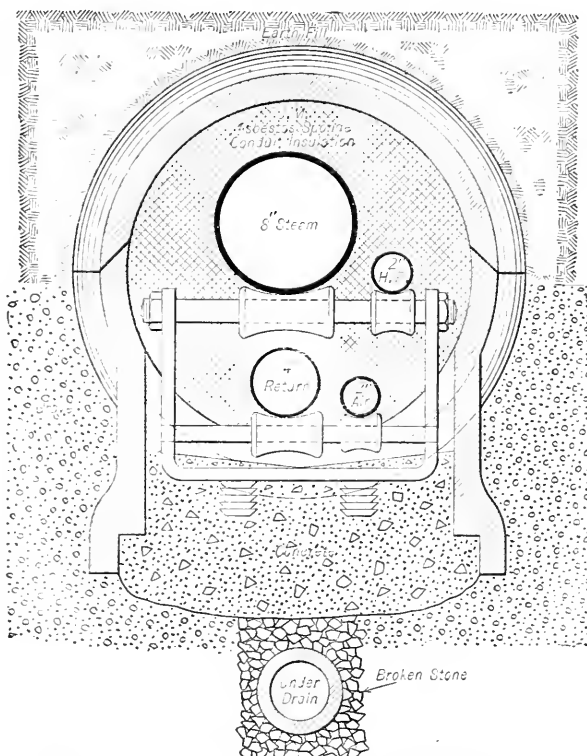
JOHNS-MANVILLE CONDUIT AND BASE DRAIN.
